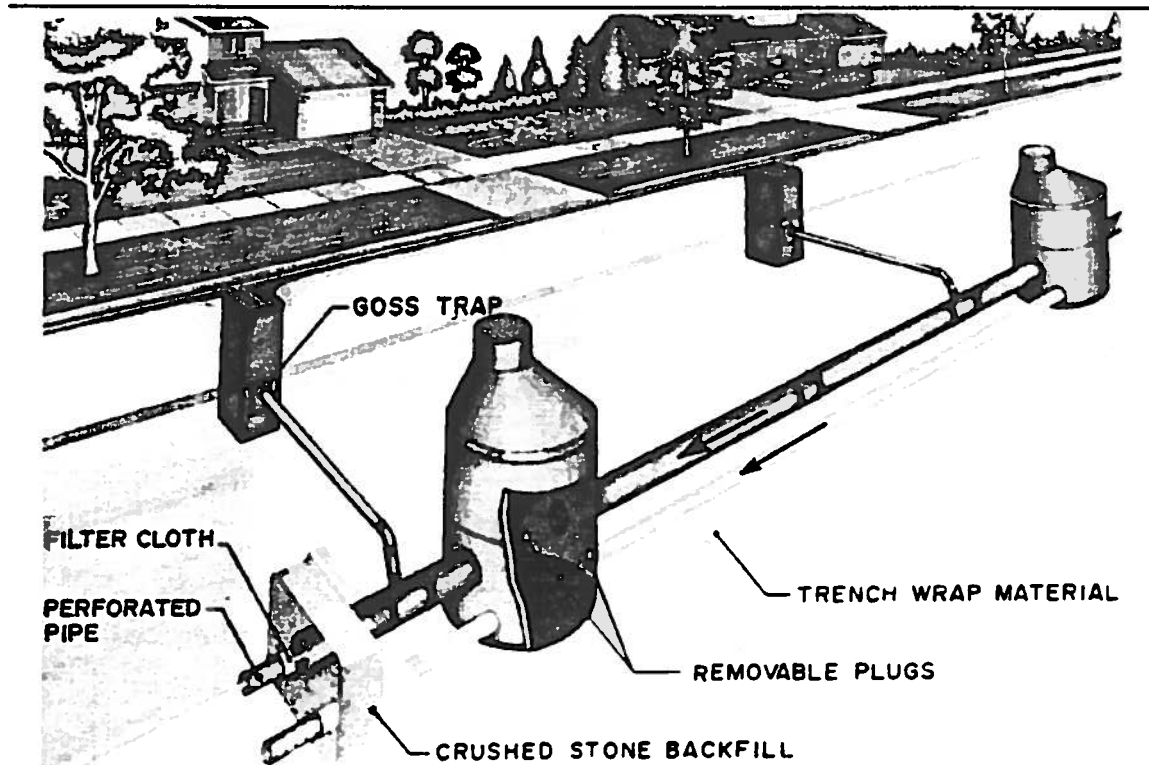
Typical curb & gutter drainage system with catchbasins and exfiltration trenches
